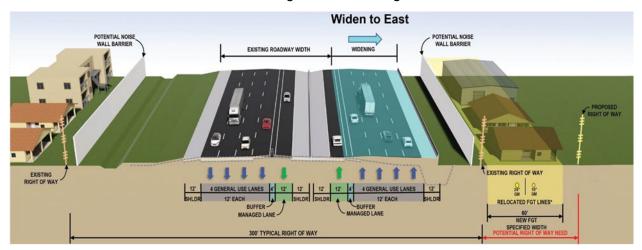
Typical Section Segment 2 - Build Alternative 3 - Widening to the East
